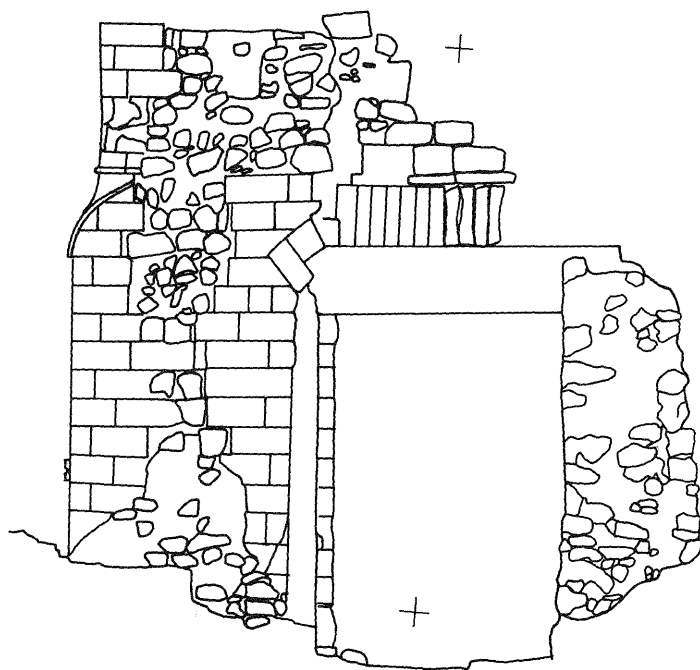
A Detail of Hasankeyf Castle, Batman. Original Scale 1:50
